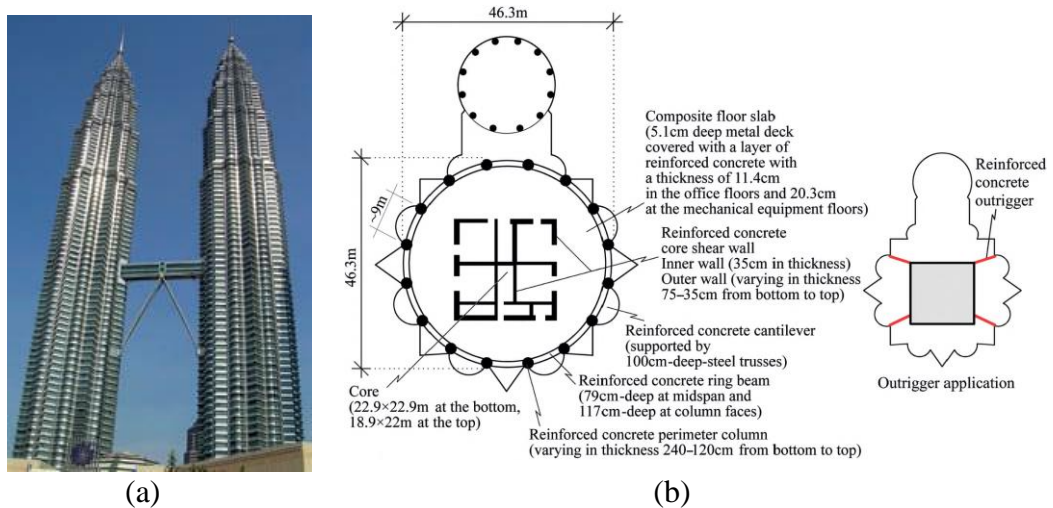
(a) Petronas Twin Towers (b) Outrigger Application
